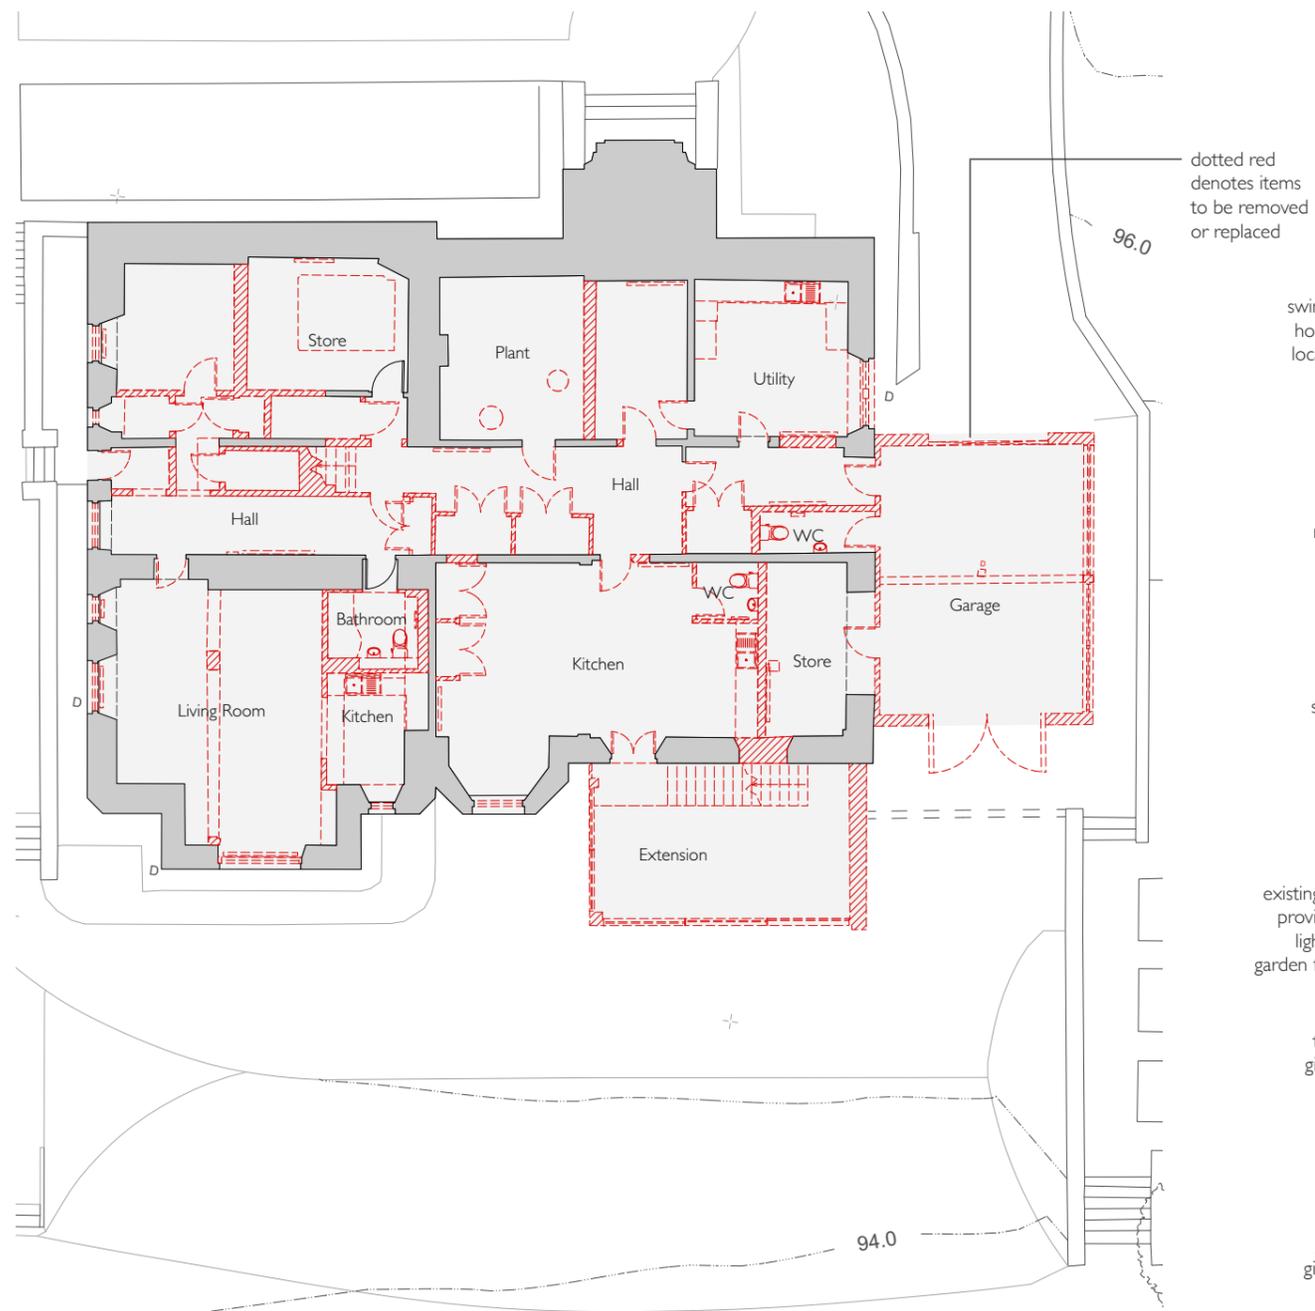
Existing Lower Ground Floor Plan
